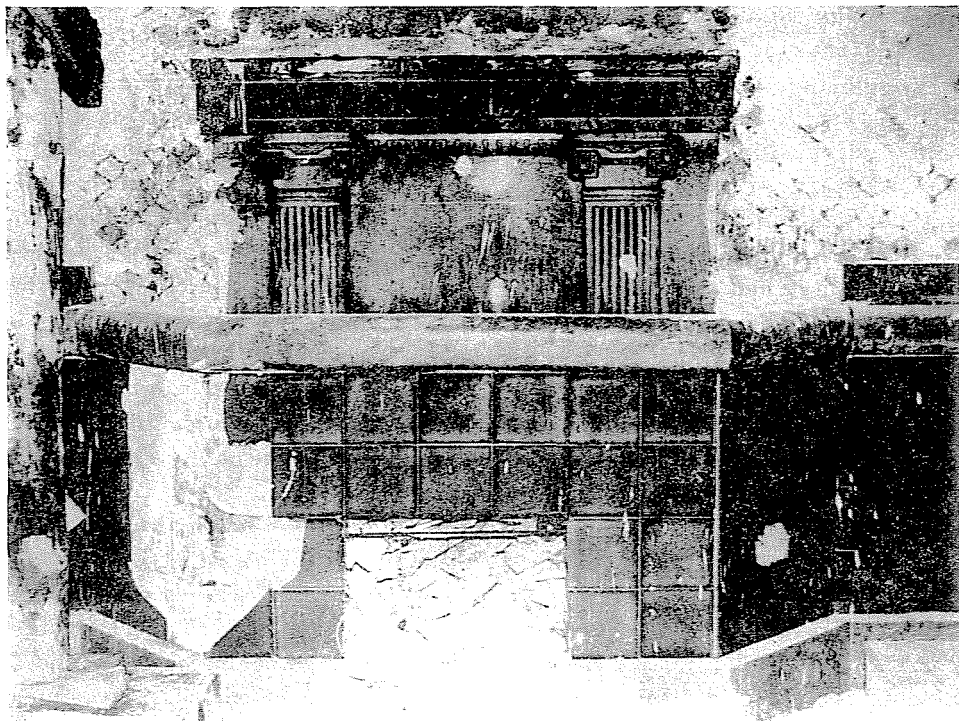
Steam bath for women, 6, Street Klauzál. Drinking fountain. Actual condition
